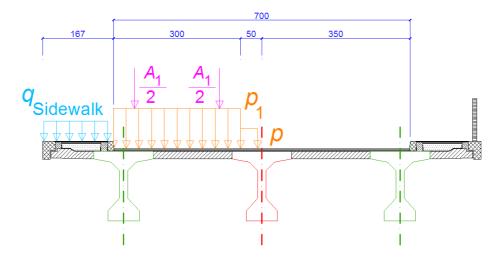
Live loads considered for calculating the moment acting on the piers
